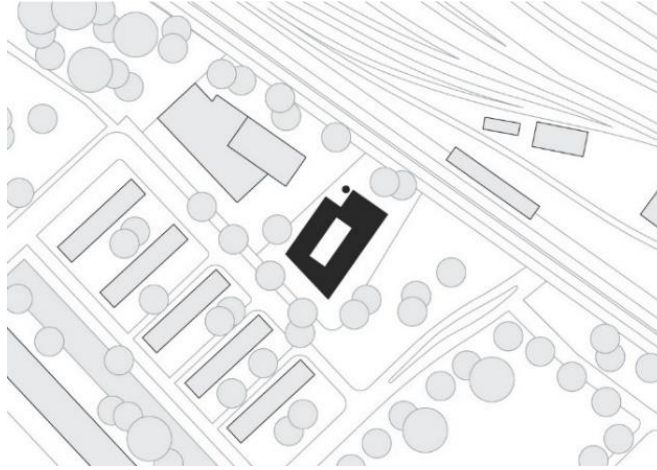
Site plan of dNM. Source: timetoaccess.com
